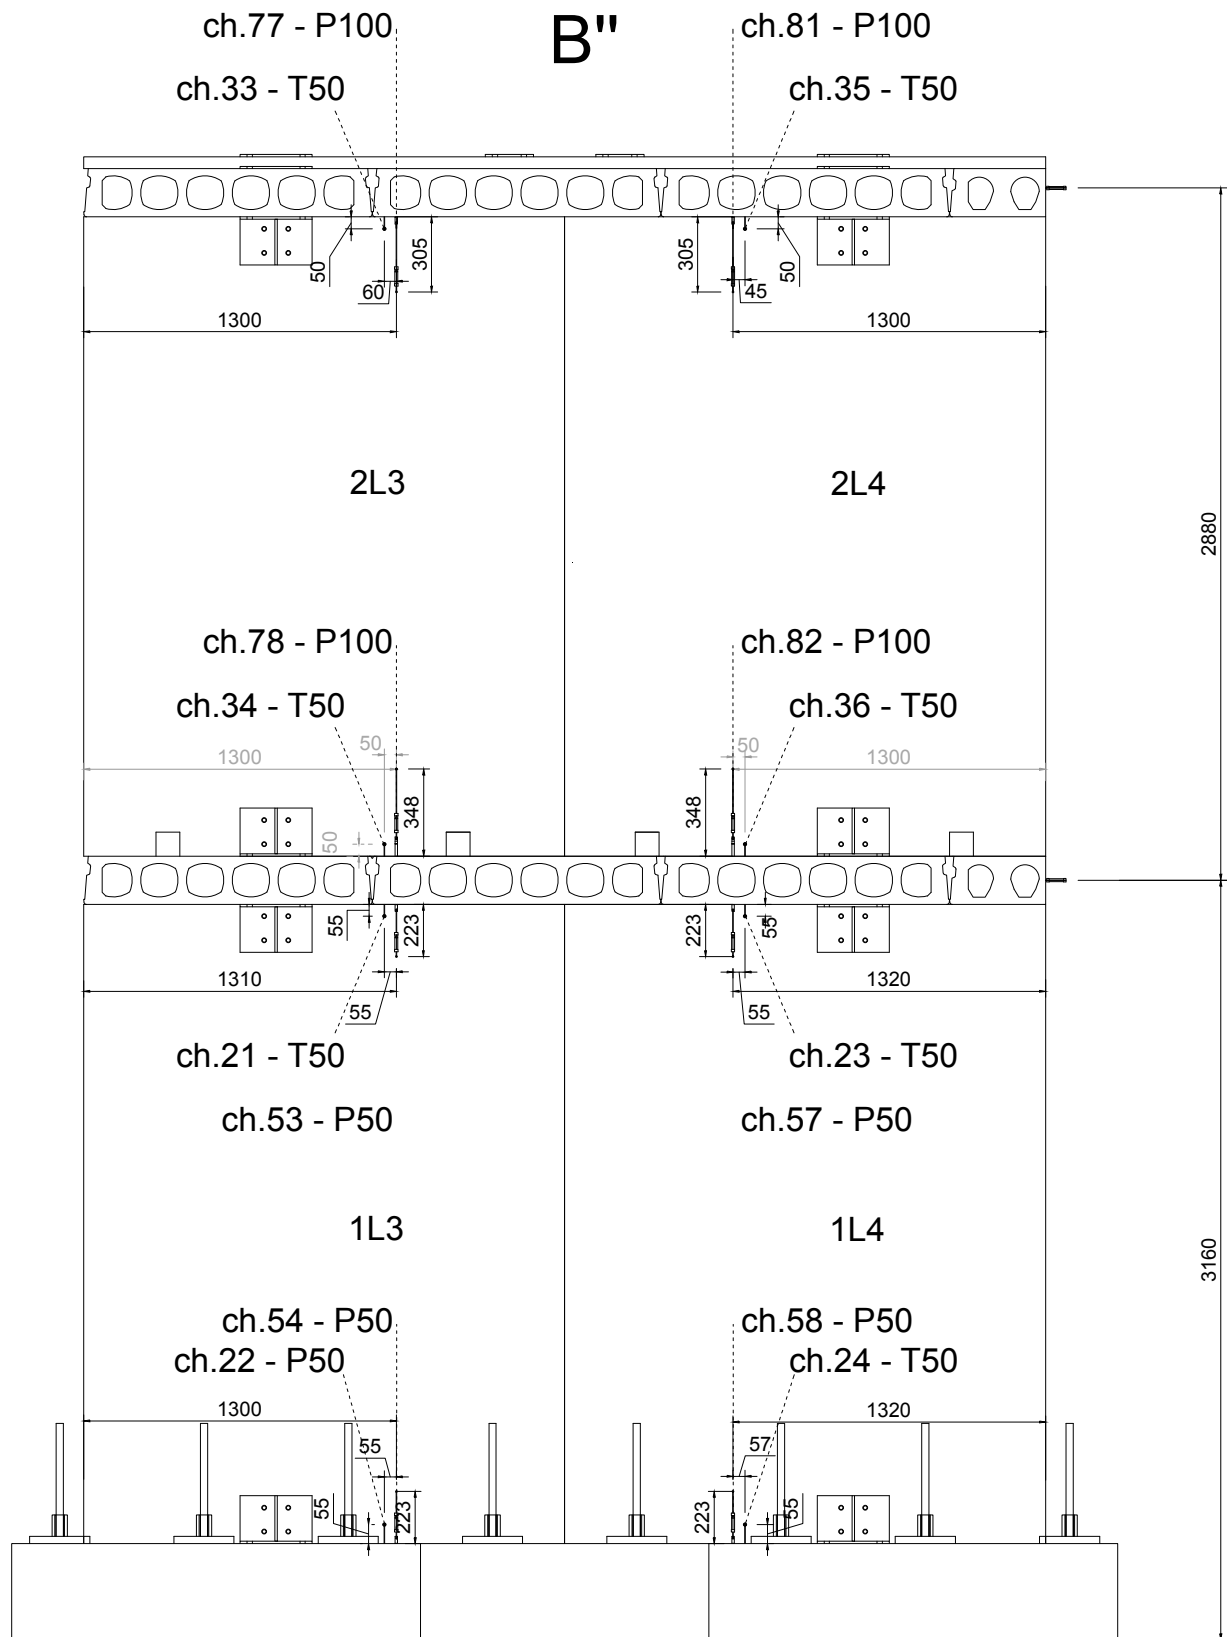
Schematic of the installed instrumentation: front views of the specimen – Lateral walls, B''.
